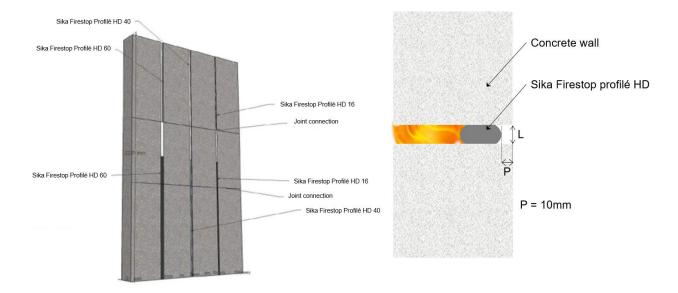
Application of Sika Firestop Profilé HD as linear joint seal of vertical concrete walls
